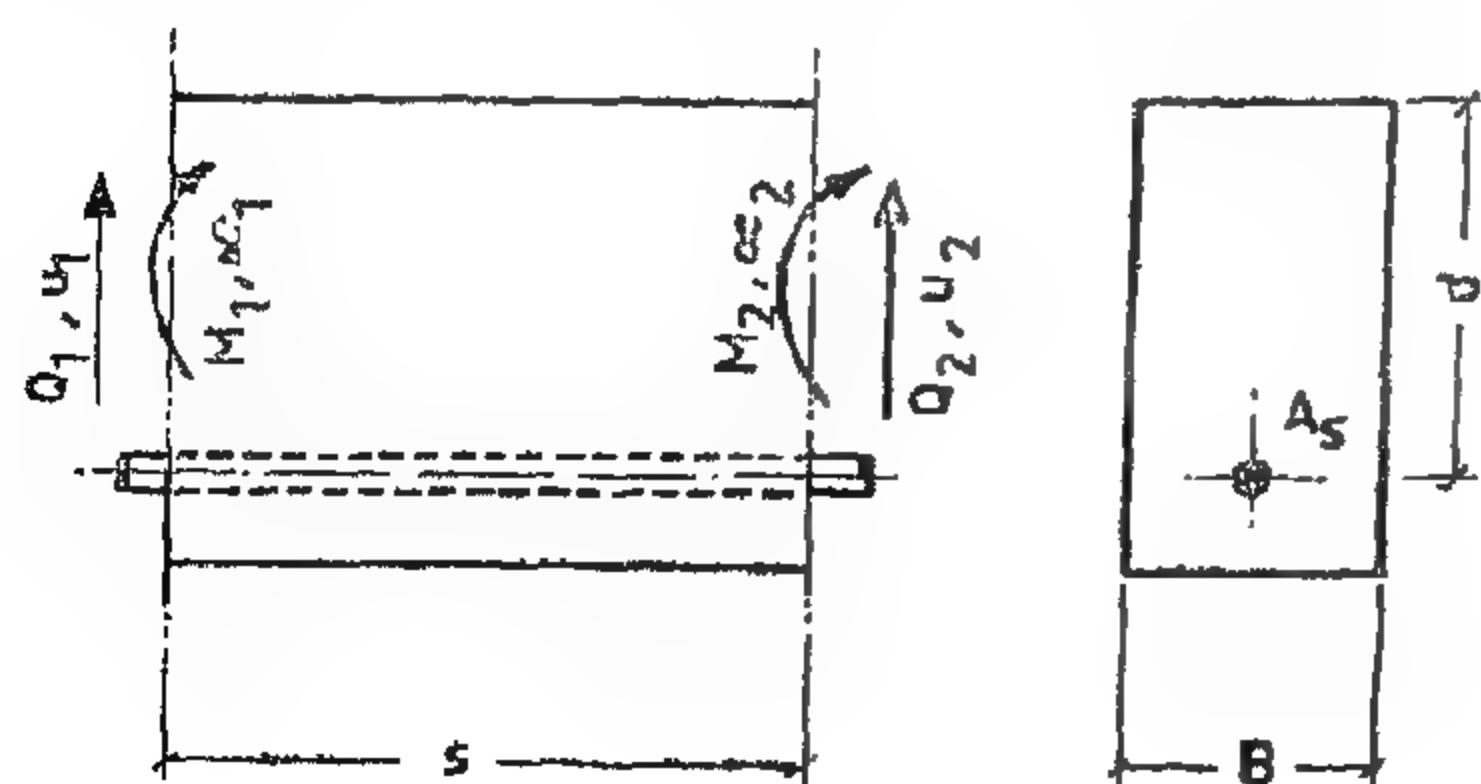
TYPICAL REINFORCED CONCRETE ELEMENT
